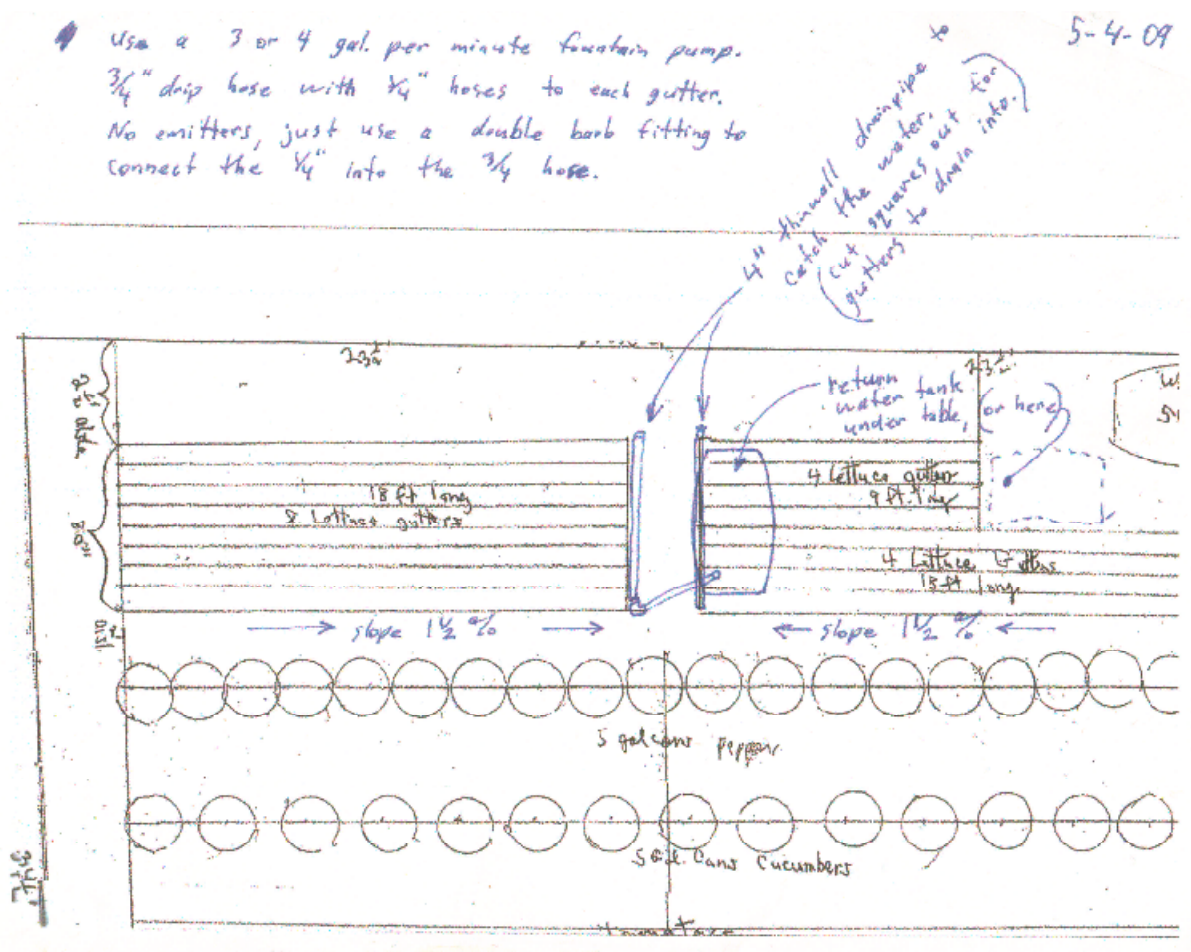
Initial Greenhouse Floor Plan Diagram
